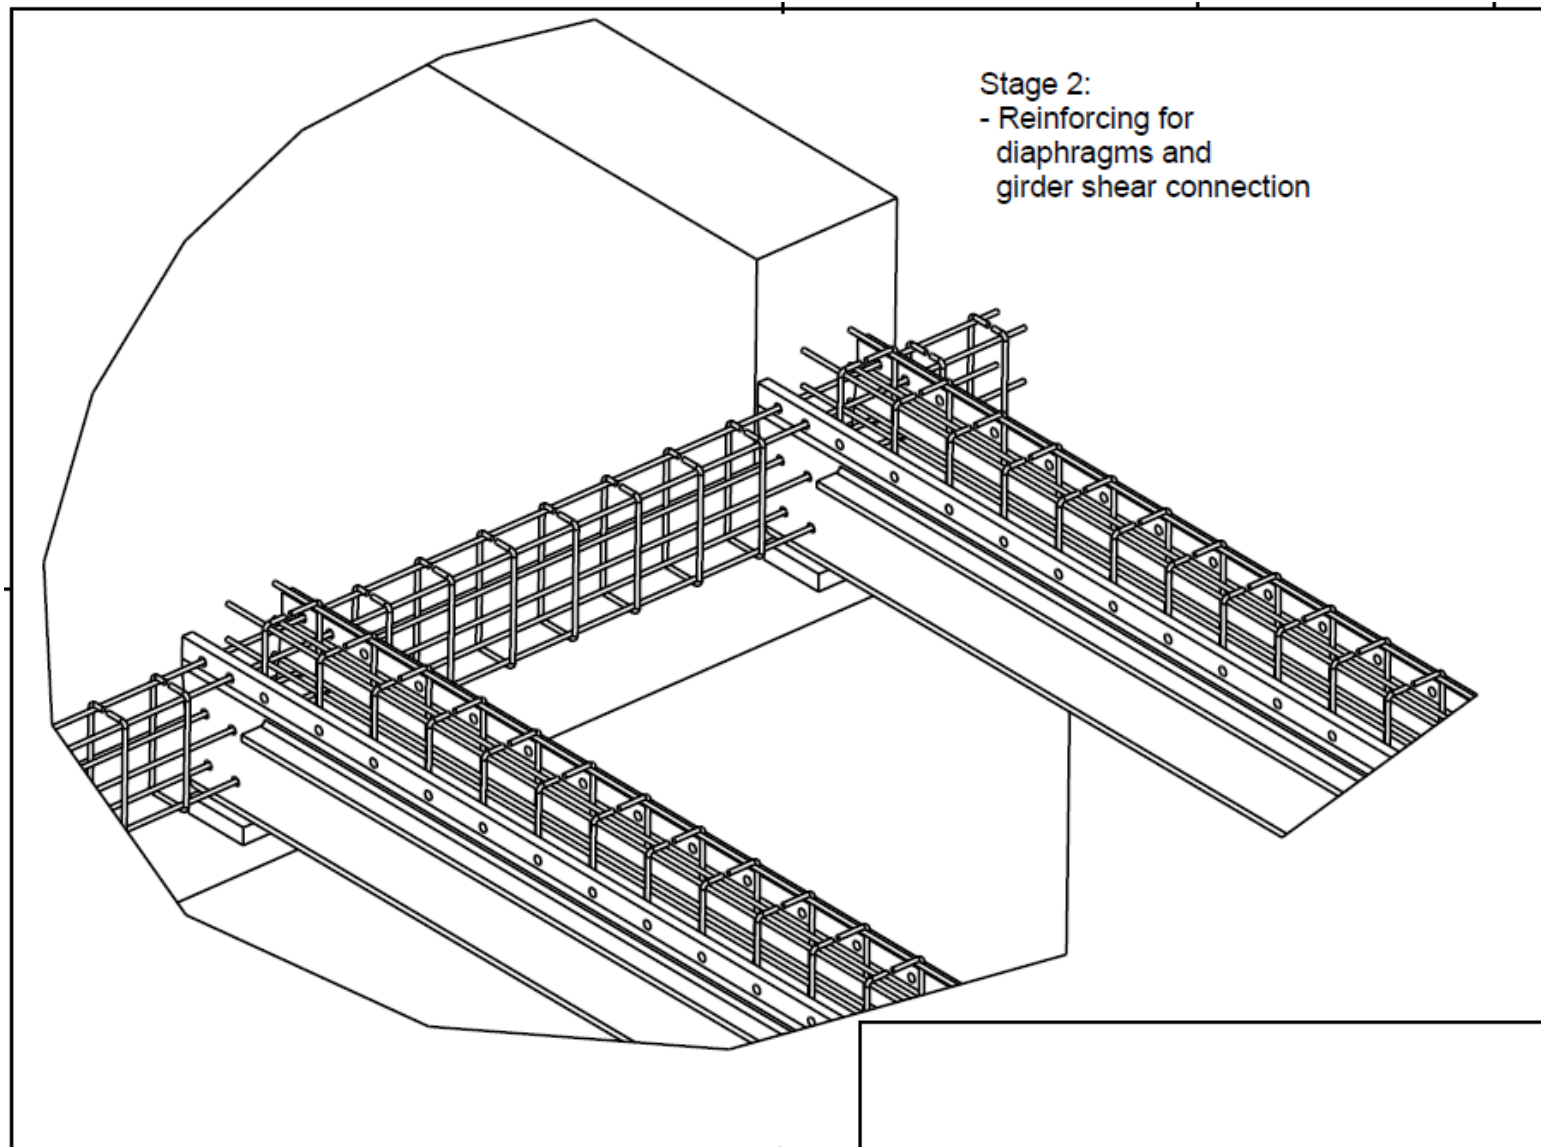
Reinforcement for diaphragms and concrete inside U-girder
